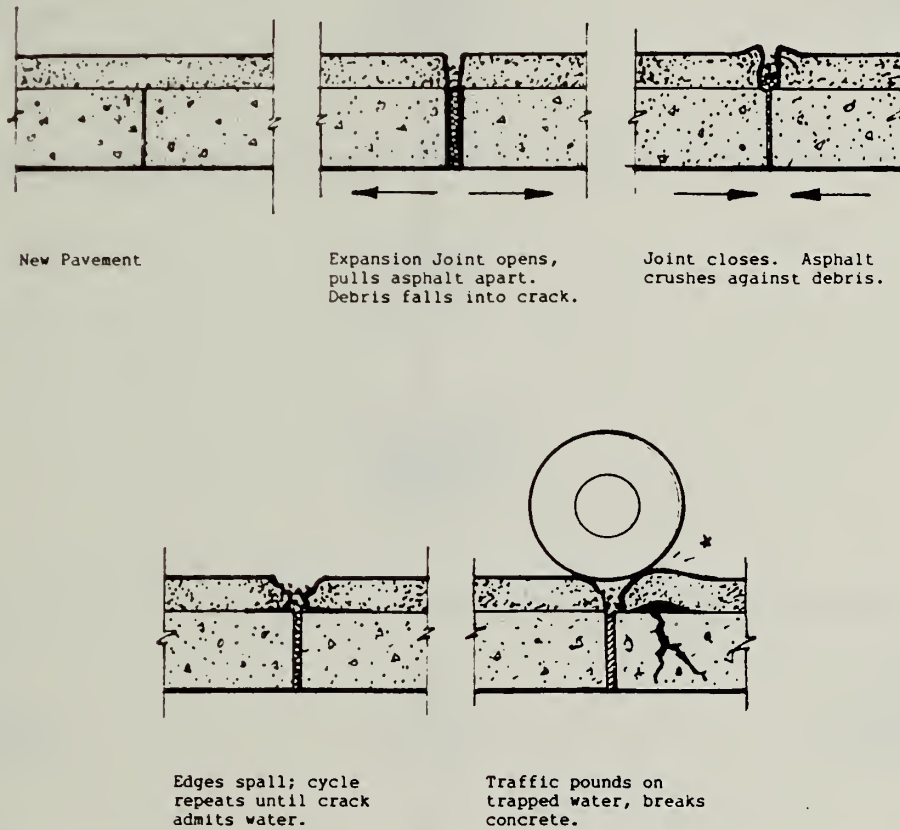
EXPANSION JOINT CRACKING CYCLE
